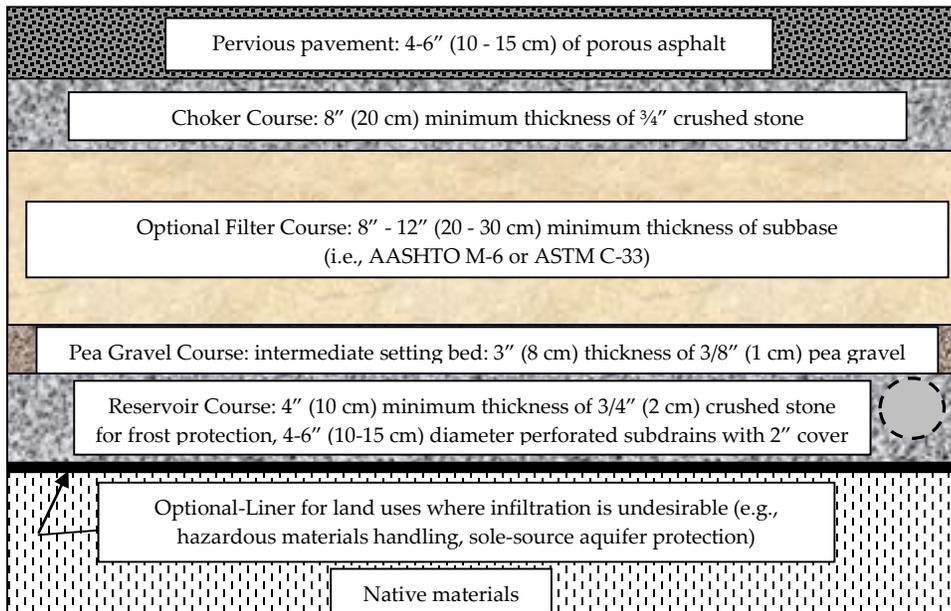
Typical Parking Area Cross-Section for Permeable Pavement System
